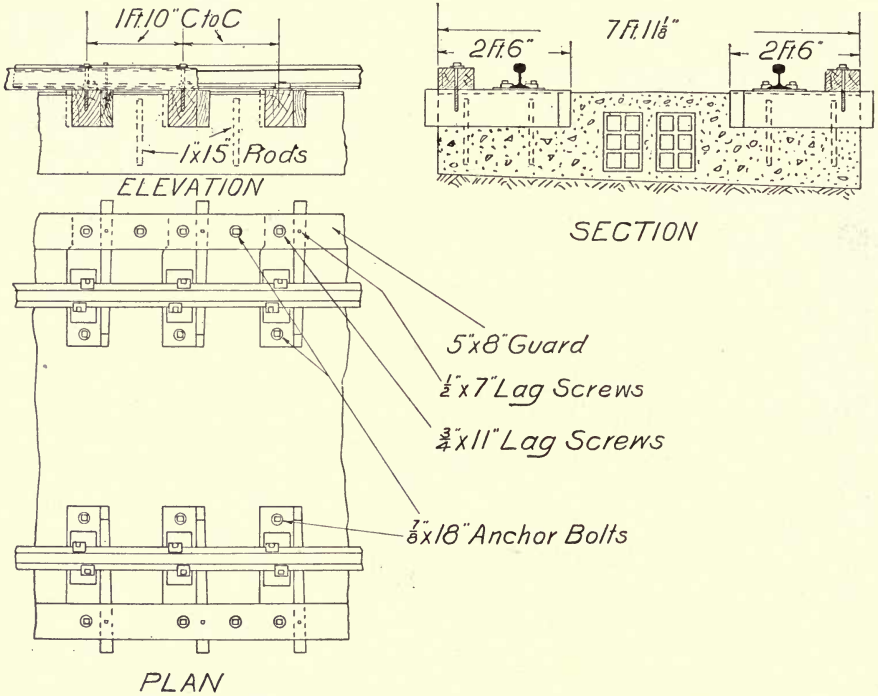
CONCRETE ROADBED, NEW BERGEN HILL TUNNEL.
